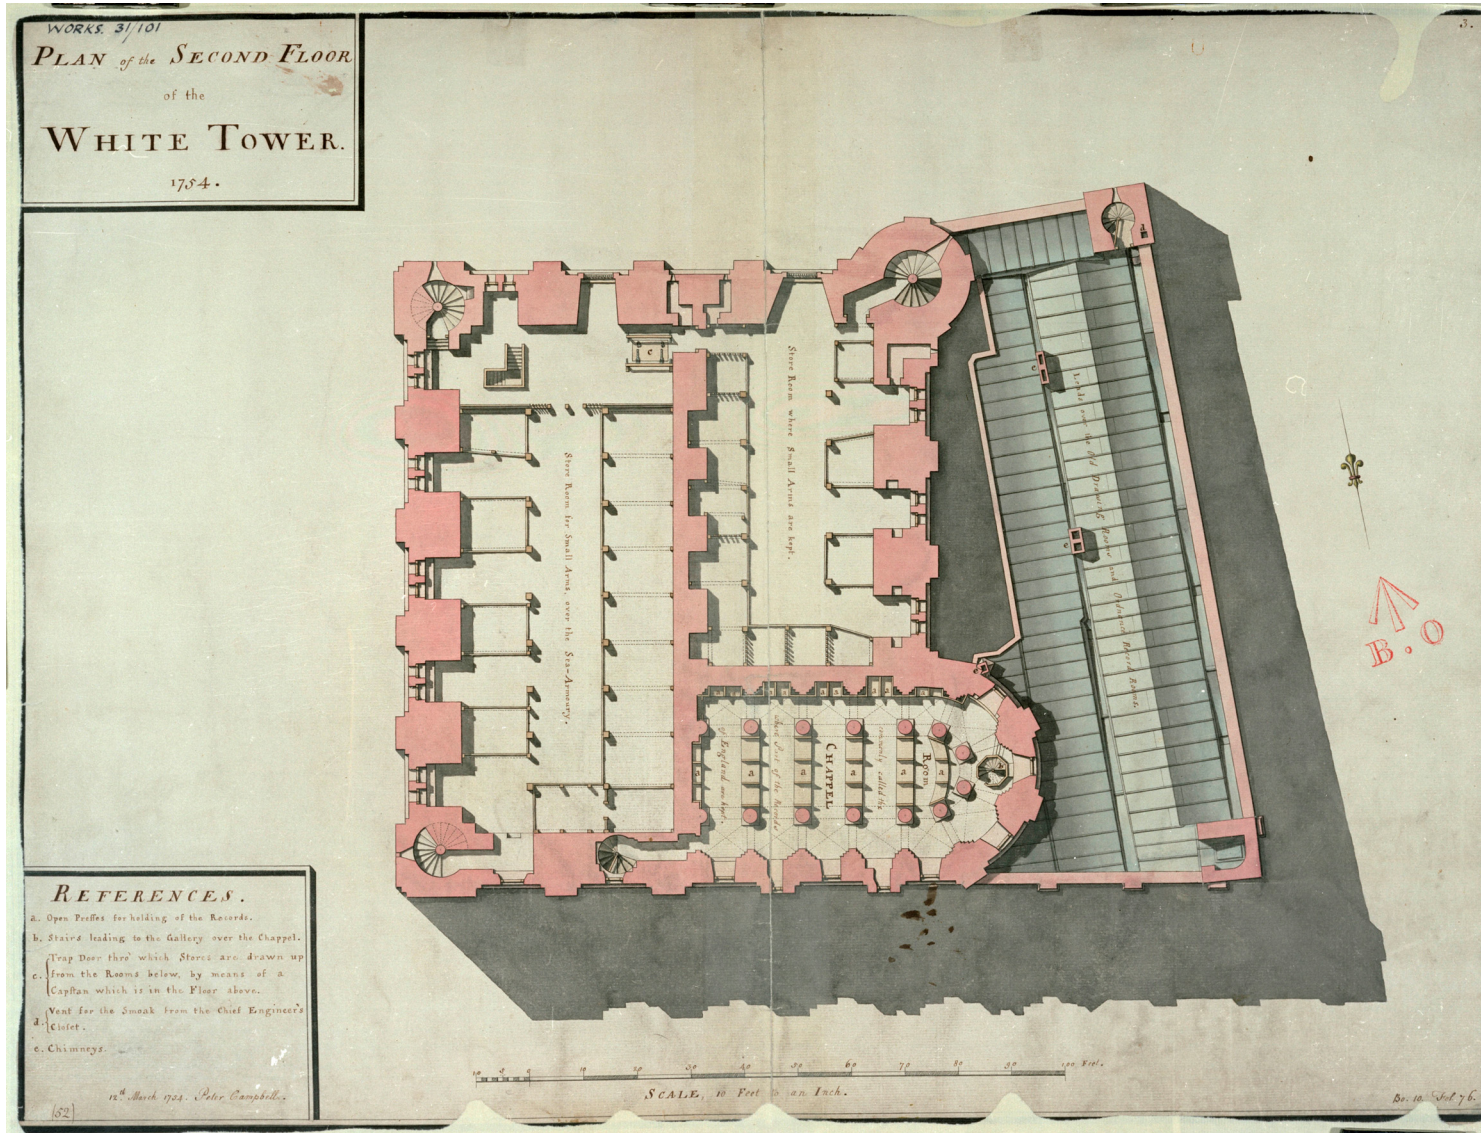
First-floor plan by Lemprière in 1754 (TNA WORK31/101, copyright The National Archives)
